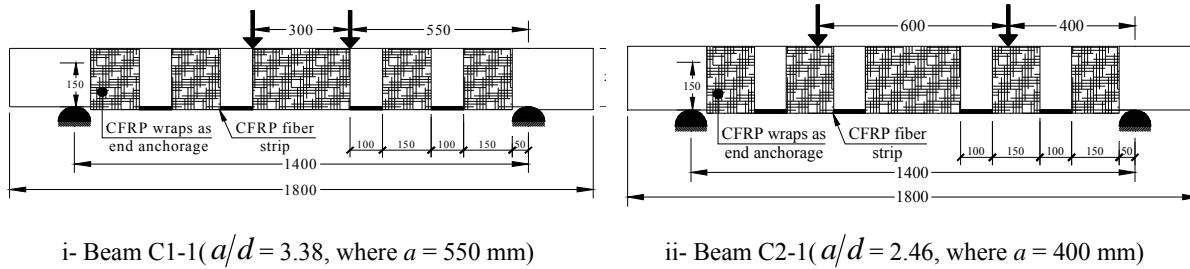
Typical strengthening scheme of the beams of Series "C"
